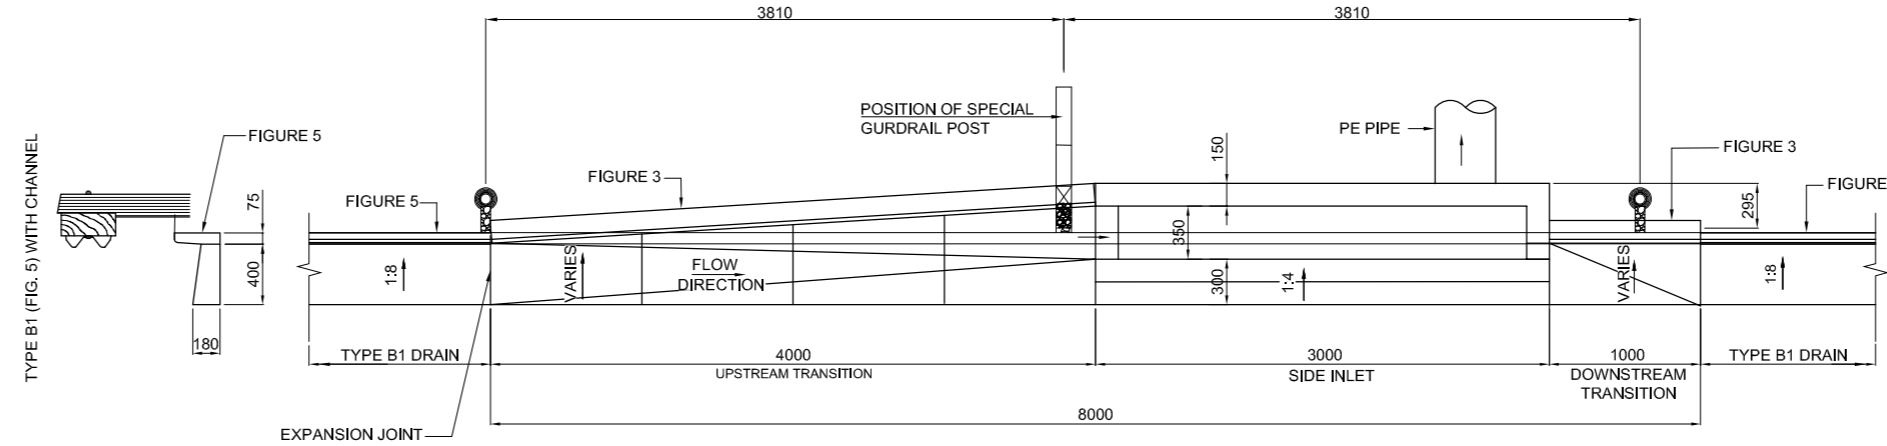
DETAIL OF TRANSITION AND OPEN SIDE INLET FOR TYPE B1 SIDE DRAIN
